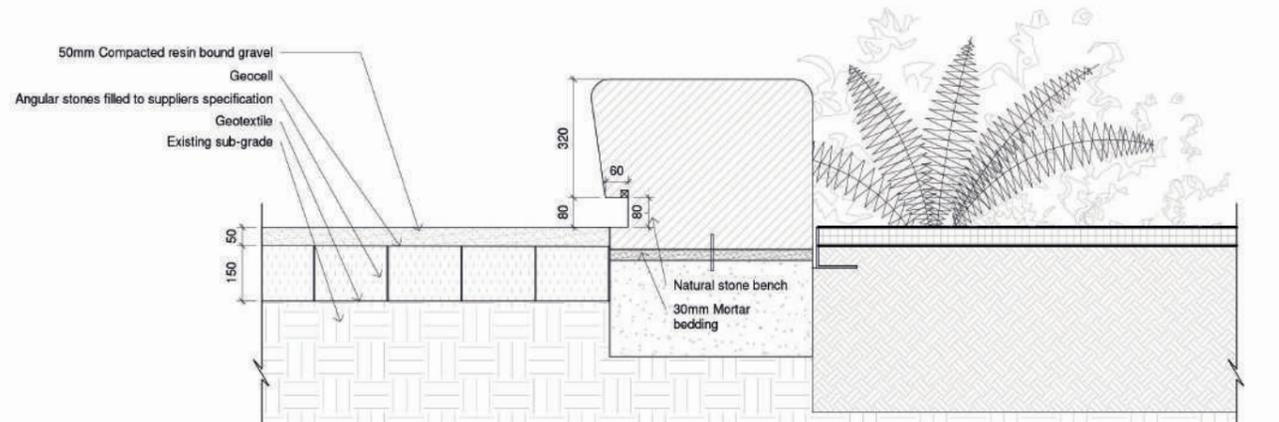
BUXTON MEMORIAL STONE BENCH TYPICAL DETAIL
